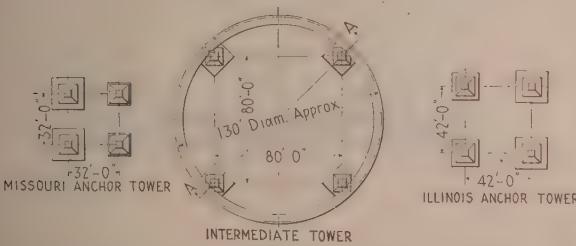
PLAN VIEW ALL FOUNDATIONS AND SCOUR APRON FOR INTERMEDIATE TOWER
